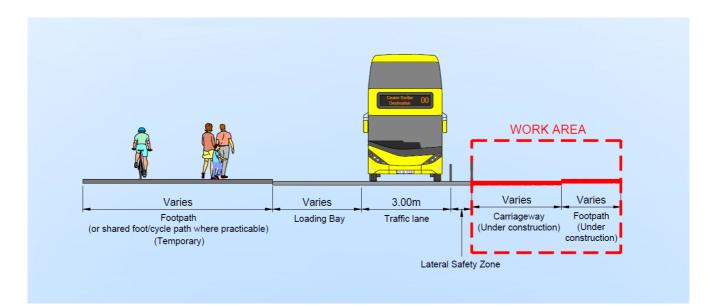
Traffic Management Cross Section, Section 5h – Stage 1
